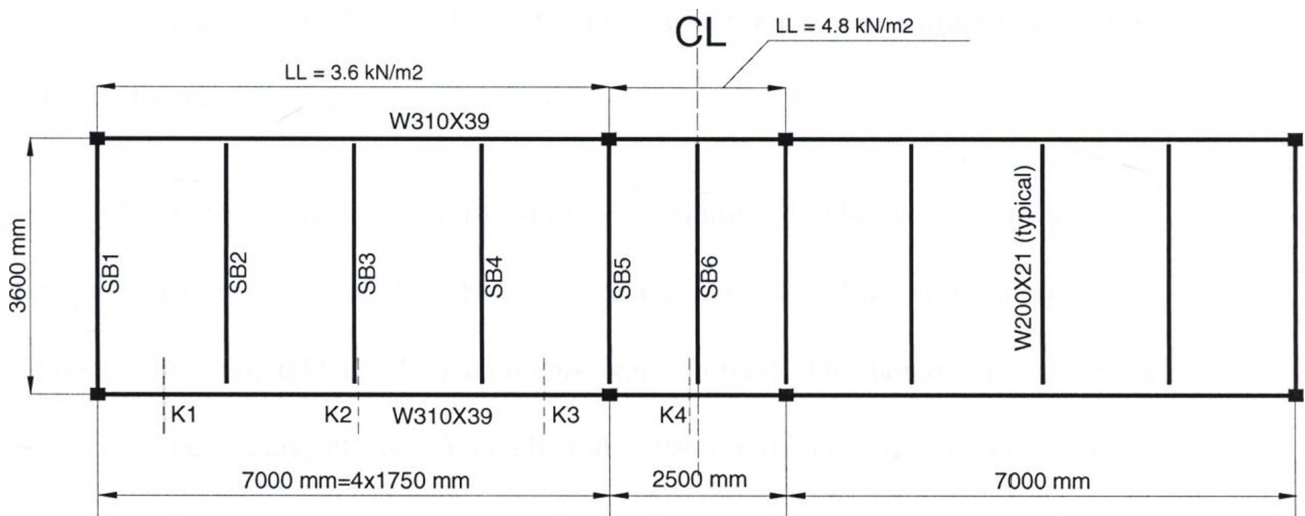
Layout of Modular Floor Framing adopted for FE Study
